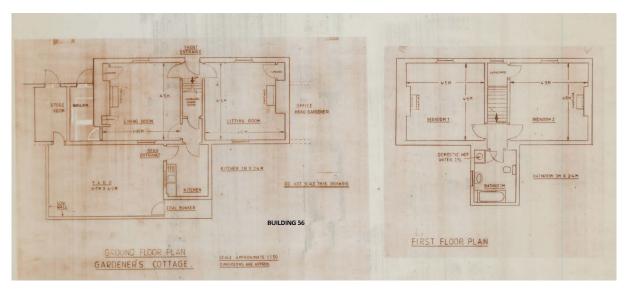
Building 56, Gardener's Cottage historic ground plan.
